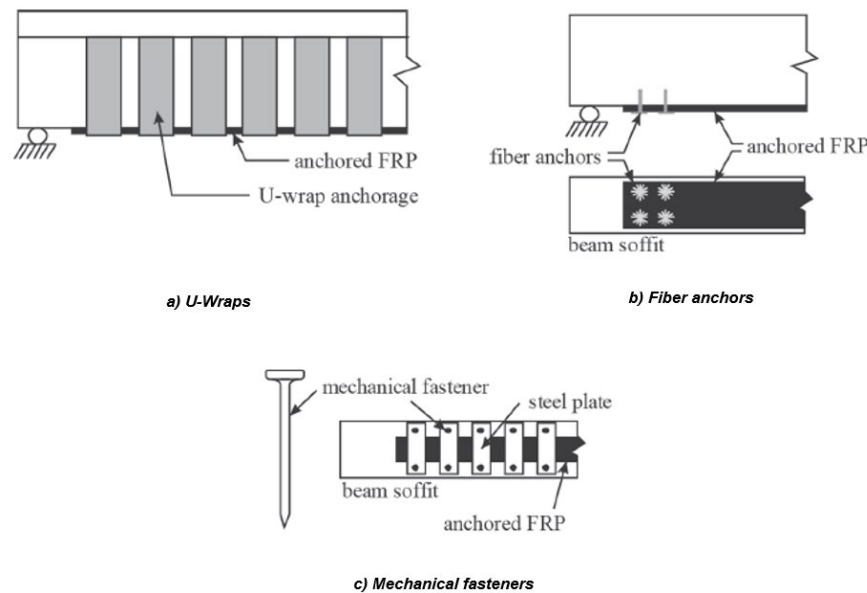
Flexural strengthening of bridge girders using CFRP (Concrete Protection & Repair Services, 2019).
